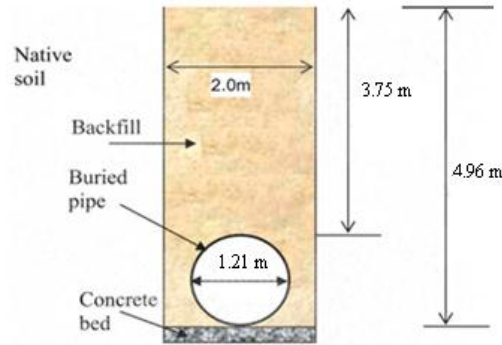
Geometrical details of the flexible buried pipe section (not to scale)
